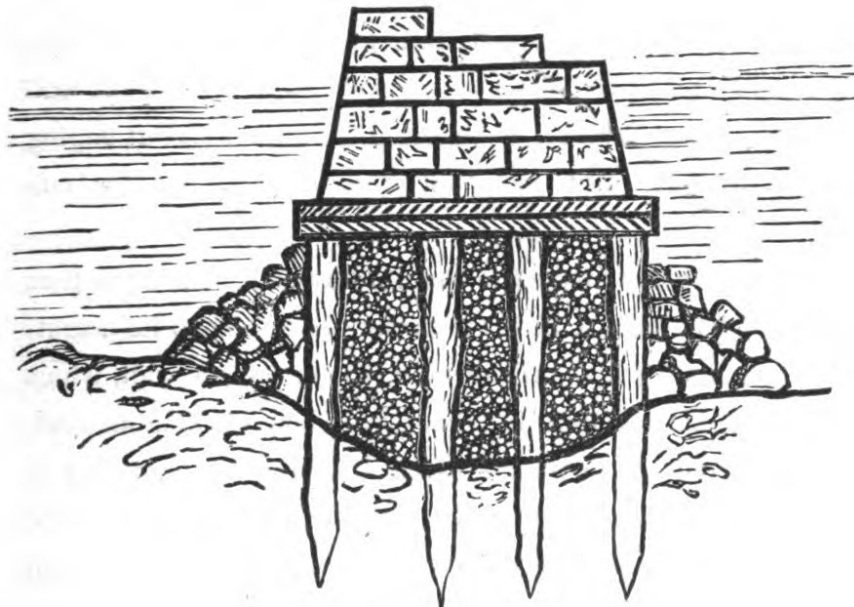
Timber piles in masonry bridge (Hasley 1883)
